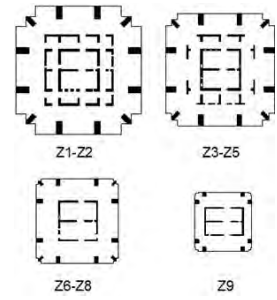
Typical layout plan for Scheme 4 (Source: Guangjing Sha)
